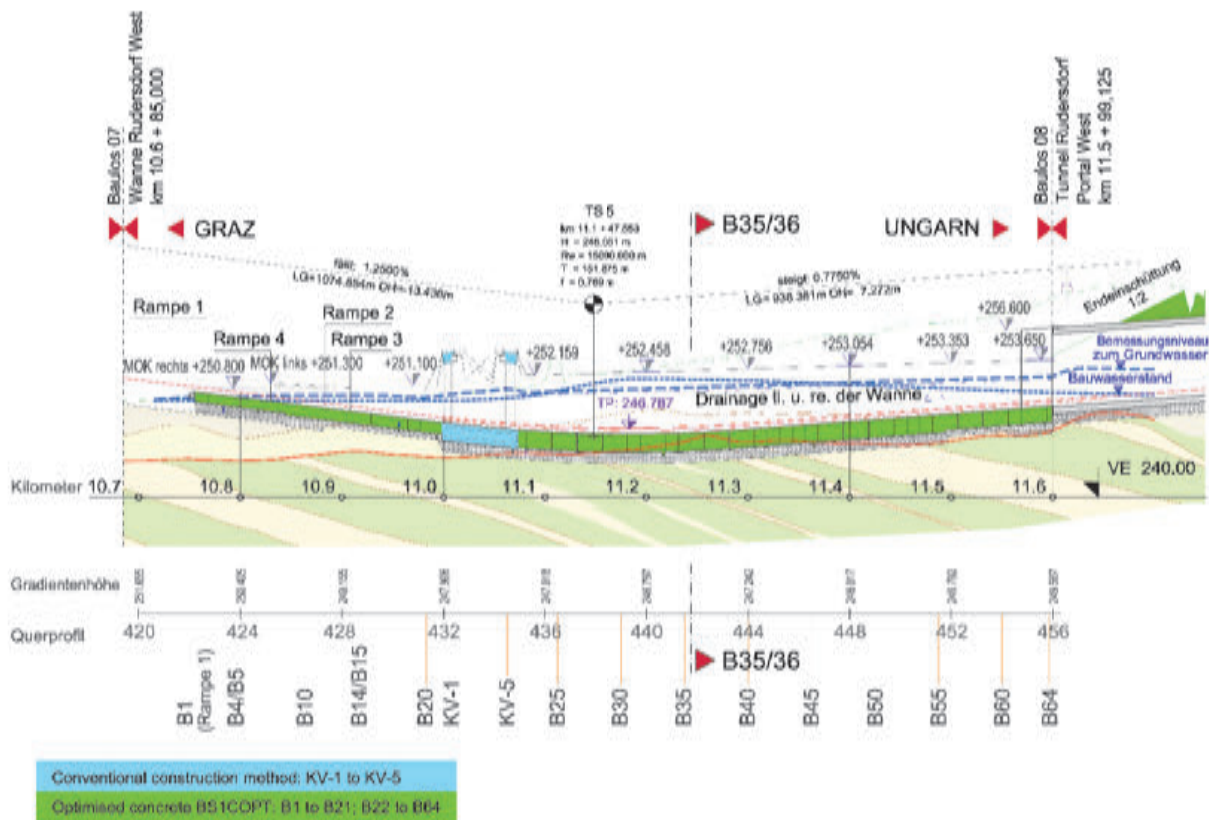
Longitudinal section S7.24b trough structure Rudersdorf West
